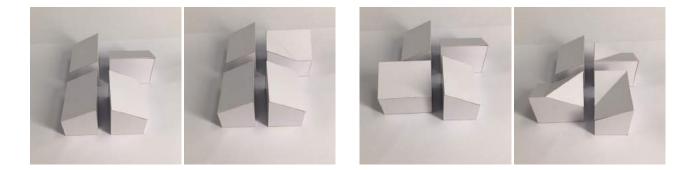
Physical modeling displaying the opportunities for 'internal' and 'external' roofs connecting with a 'sloped' roof
